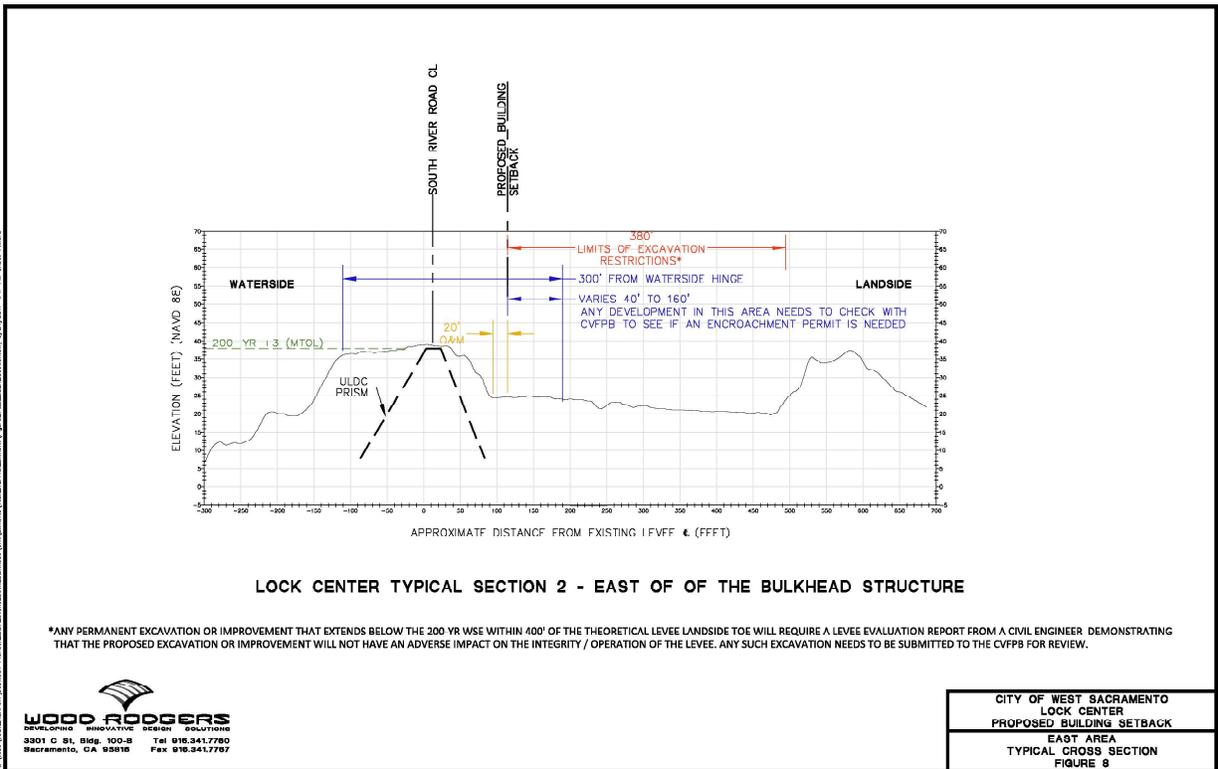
shows the Stone Lock District’s Lock Center neighborhood’s building setback’s corresponding typical cross-sections east of the Bulkhead Structure. The ULDC prism is centered on the centerline of the existing South River Road. The excavation limits extend far back into the property. The process for memorializing the preferred building setback is the same as the Barge Canal Neighborhood. The timeframe for memorializing this is discussed in Section 4.8.6. See Section 4.4.1 for additional information regarding the excavation restriction line.
